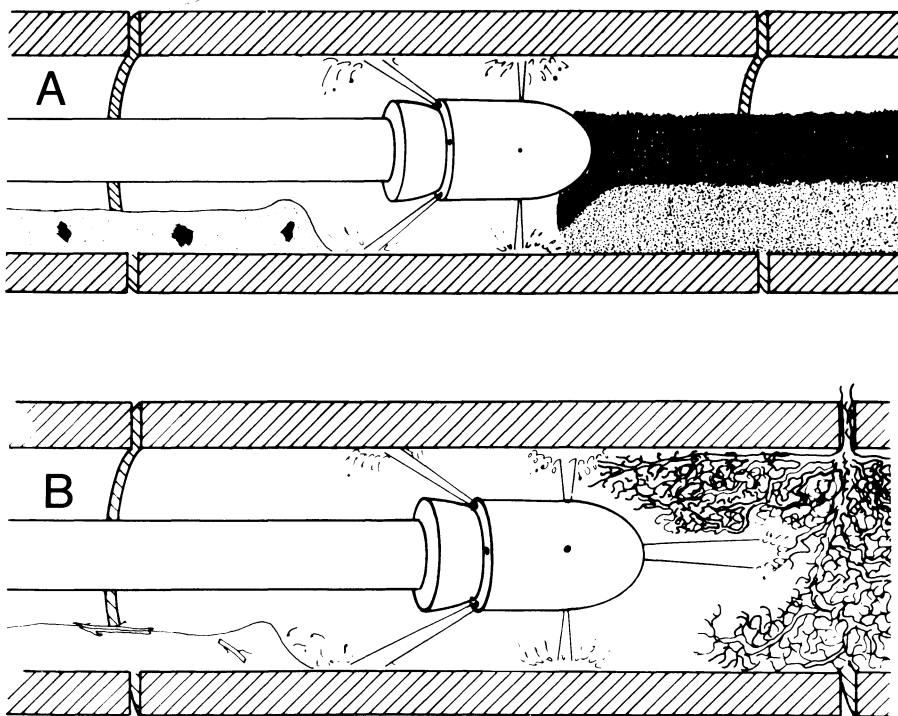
Use of high-pressure jet nozzles in subsurface drains. A, Scouring and removing silt and mineral deposits; B, removing roots.
